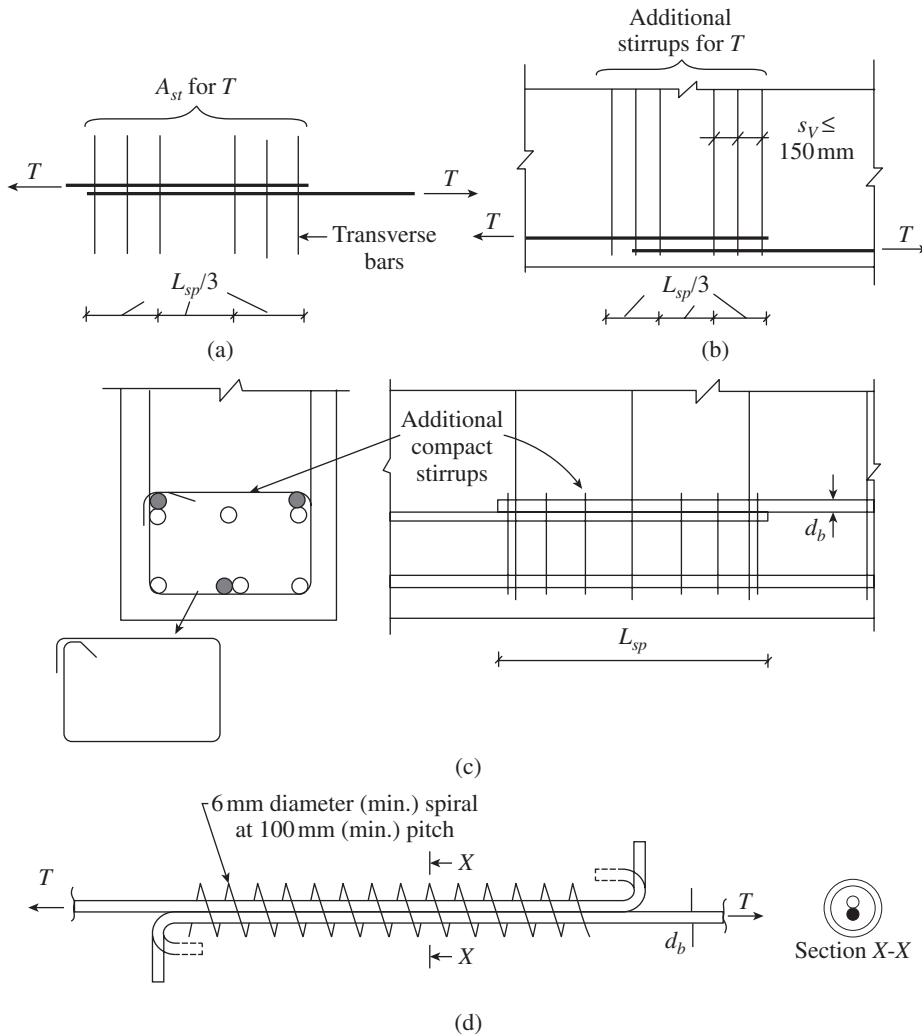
Transverse reinforcement at tension splice (a) Tension splice (b) Transverse reinforcement at the end 1/3rd lengths of splice with minimum three stirrups at each end (c) Additional compact stirrups when large bars are spliced in two rows (d) Splices in direct tension members to be enclosed in spirals
